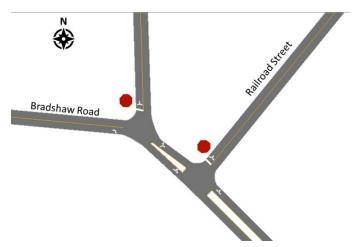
Existing Bradshaw Road and Railroad Street intersection configuration.
